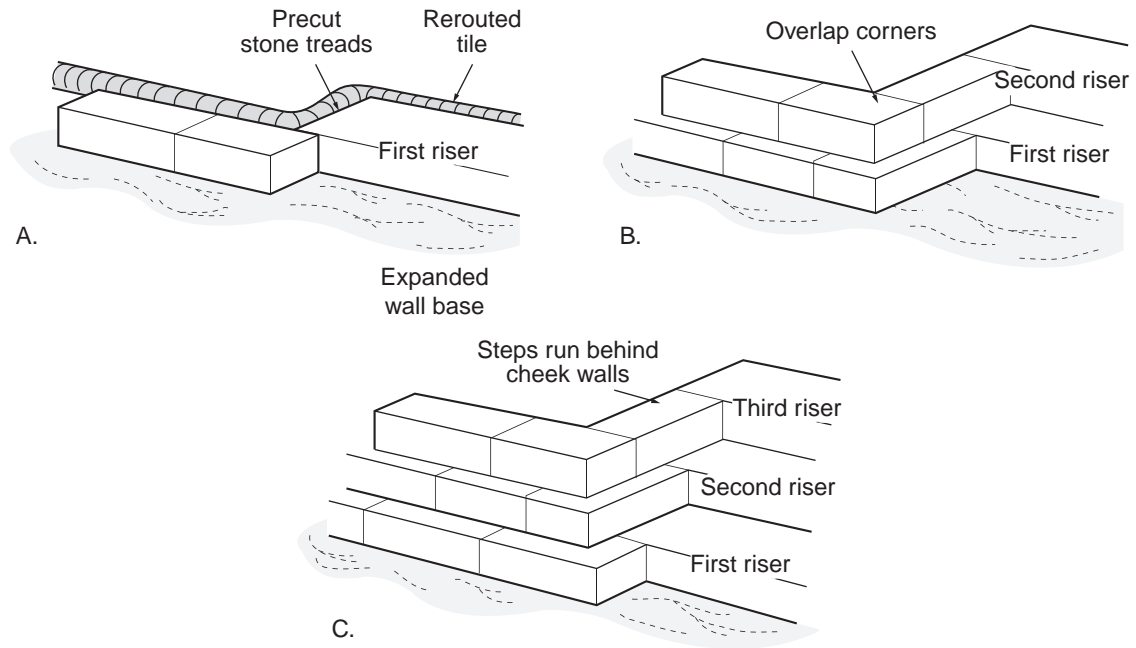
Interlocking stair construction with segmental precast units. A. Base trench and first course for interlock stairs. B. Second course for interlock stairs. C. Subsequent courses for interlock stairs. (Note: First course will be completely or partially buried.)
